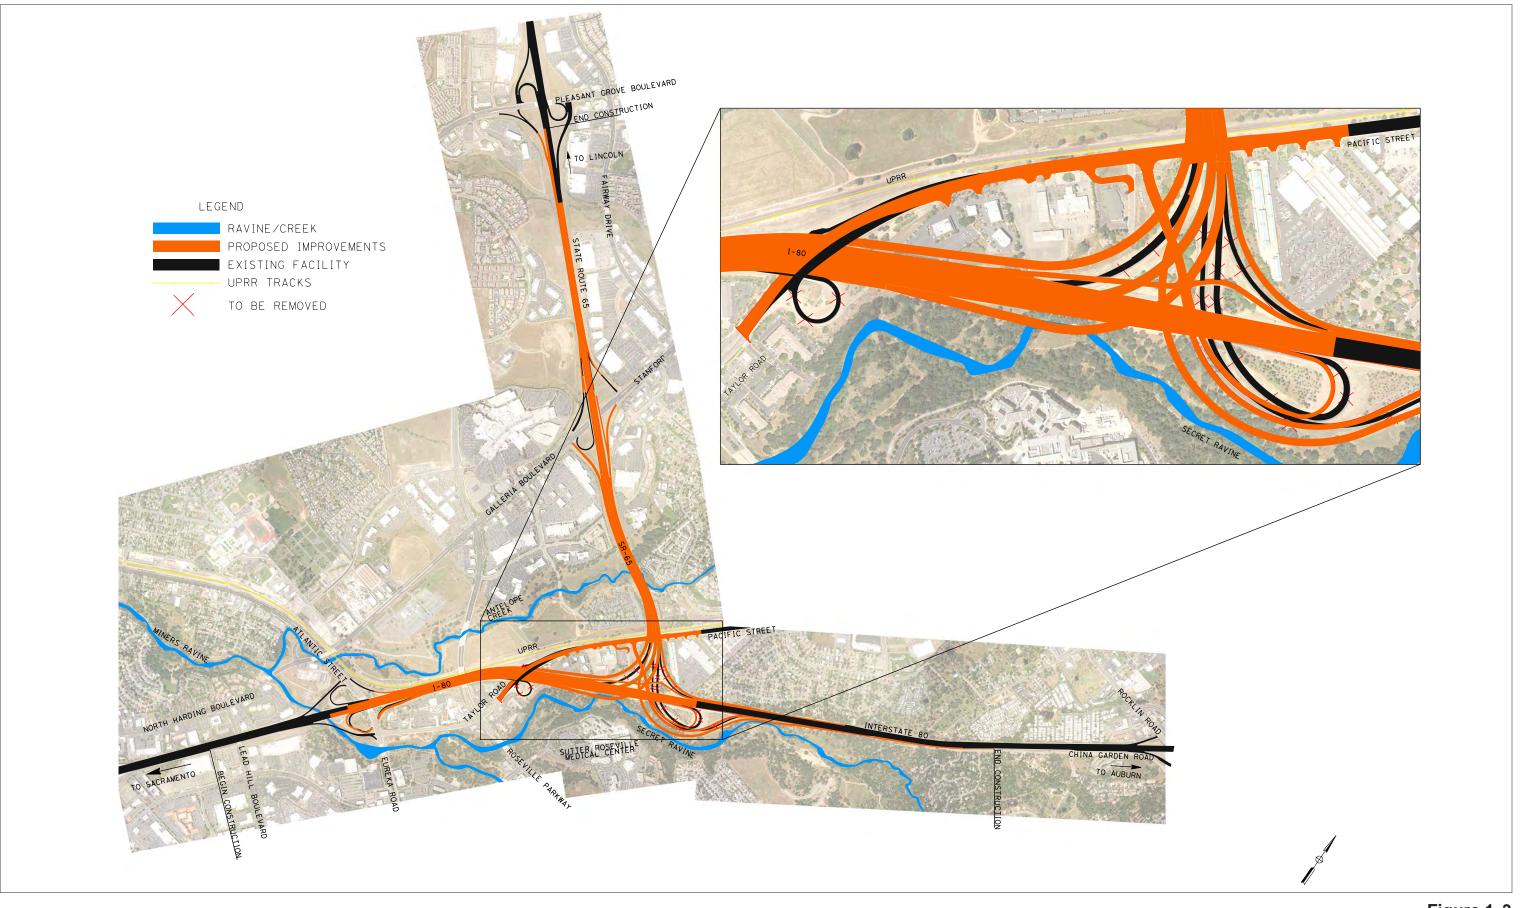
Alternative 1—Taylor Road Full Access Interchange
